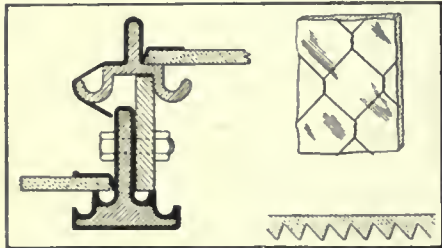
SECTION THROUGH JOINTING OF SKYLIGHT WITH MAIN SASH FRAME. PENNYCOOK'S PATENT GLAZING.
